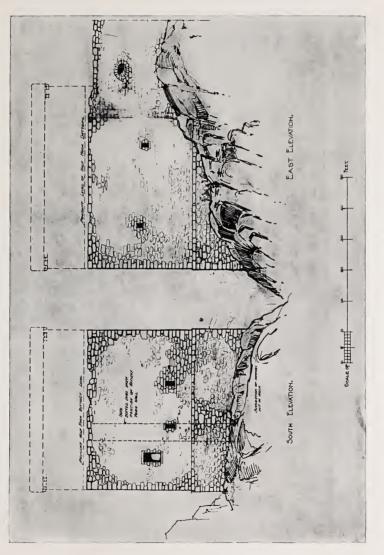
EXTERNAL FACE OF DAVID'S TOWER WHERE FIRST EXPOSED
